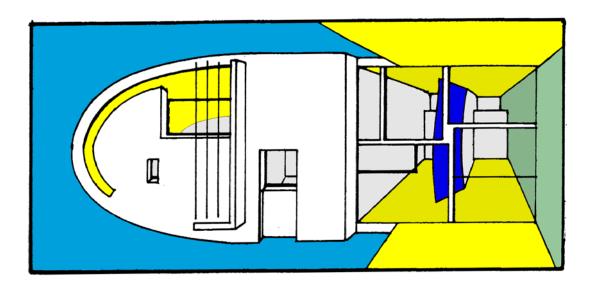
Rear elevation of Doris's Place, shown from basement-level courtyard in apartment 1
